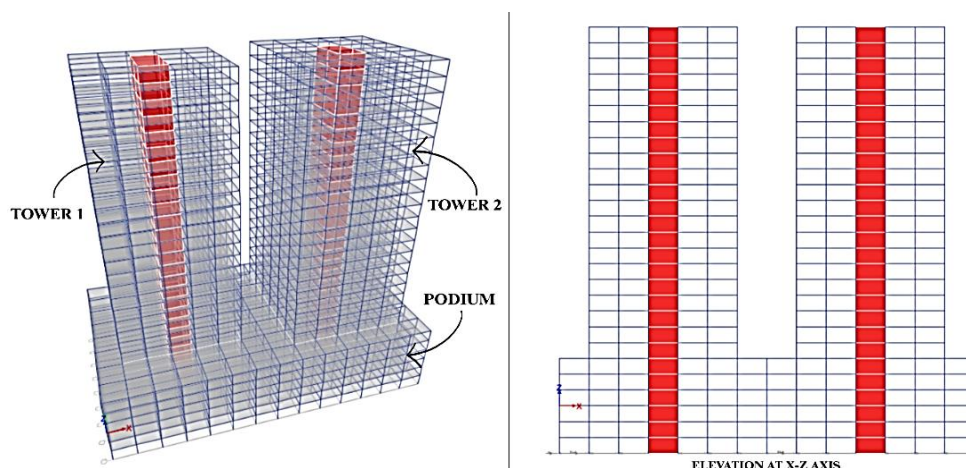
3D view and elevation of model without retaining wall at basement floors.
